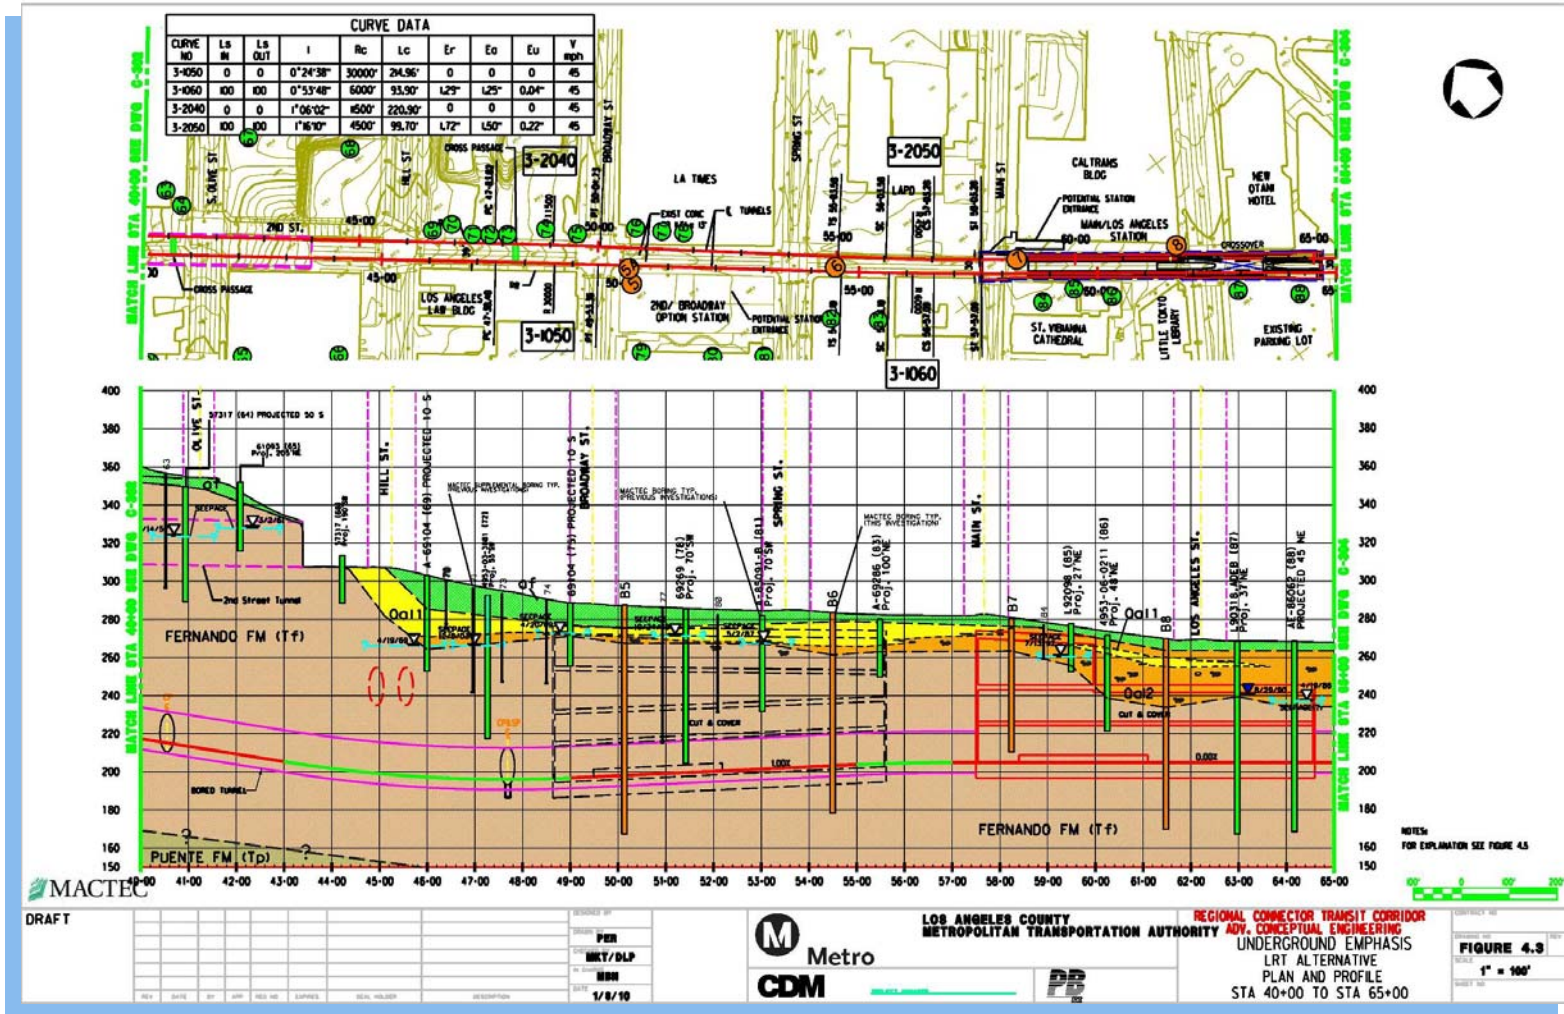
Underground Emphasis LRT Alternative Typical Underground Conditions
